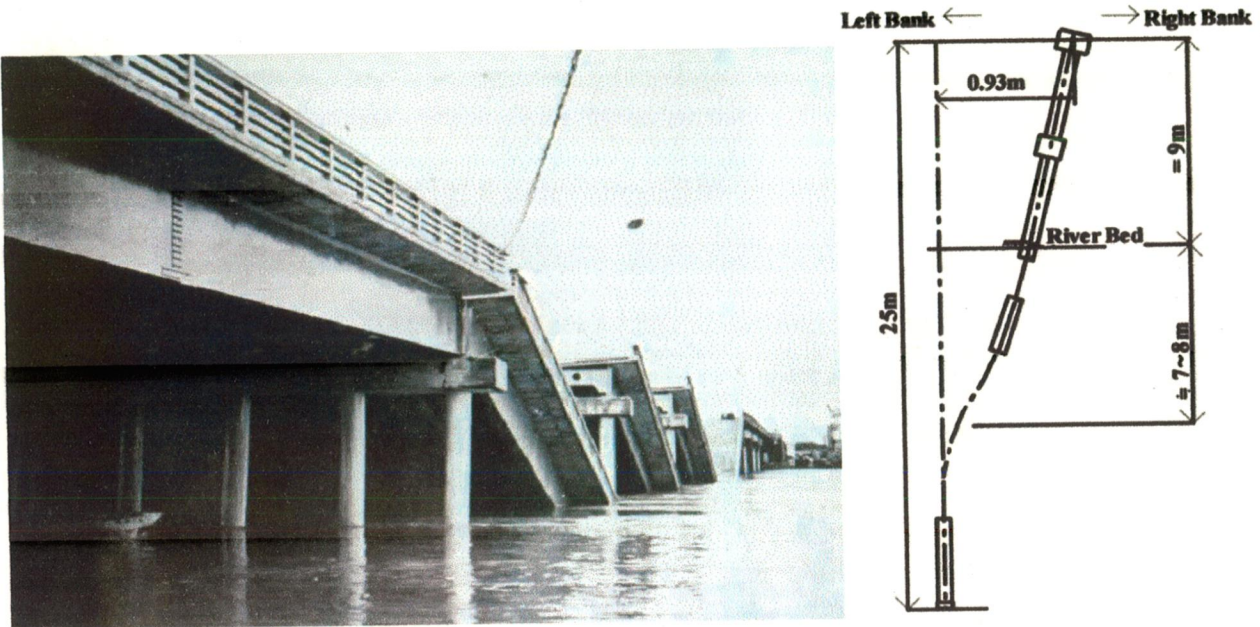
Damage to Steel Piles of Pier 4 of Showa Bridge (Boulanger et al., 2003)
